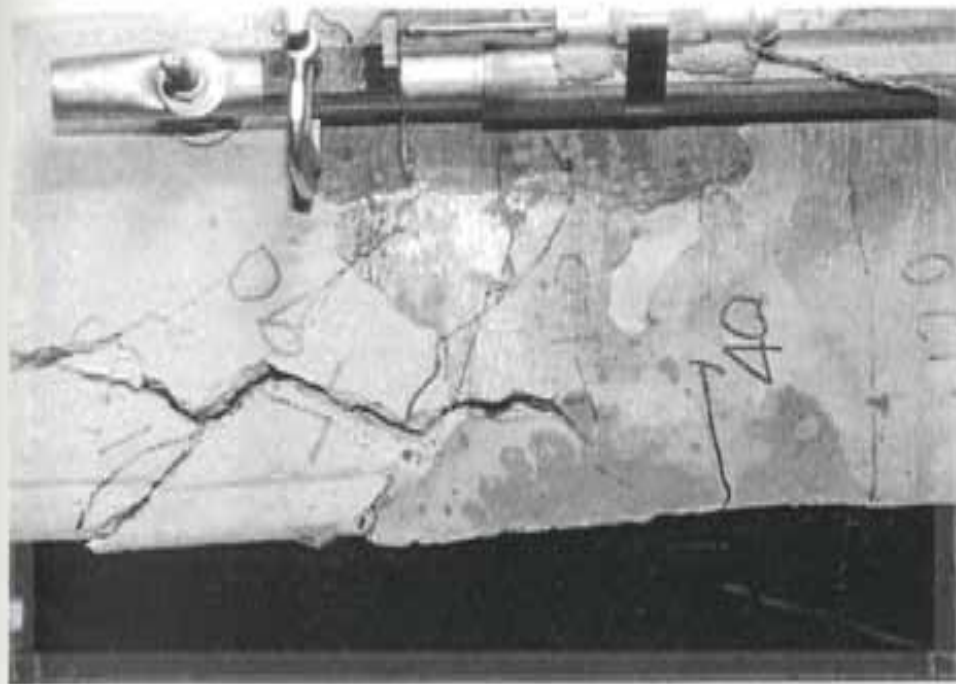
Cracks in specimen S-WS-2 developed by offset forces in spliced bars
